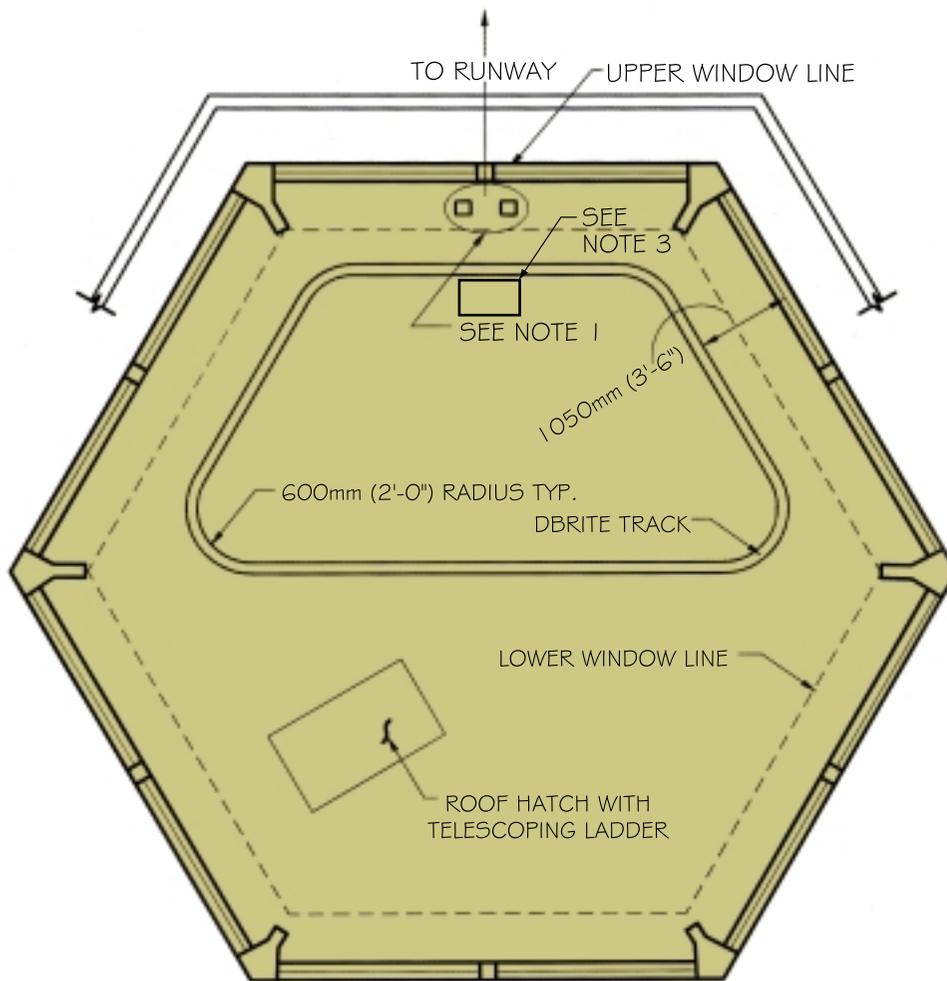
| Control Cab [Reflected Ceiling Plan]
